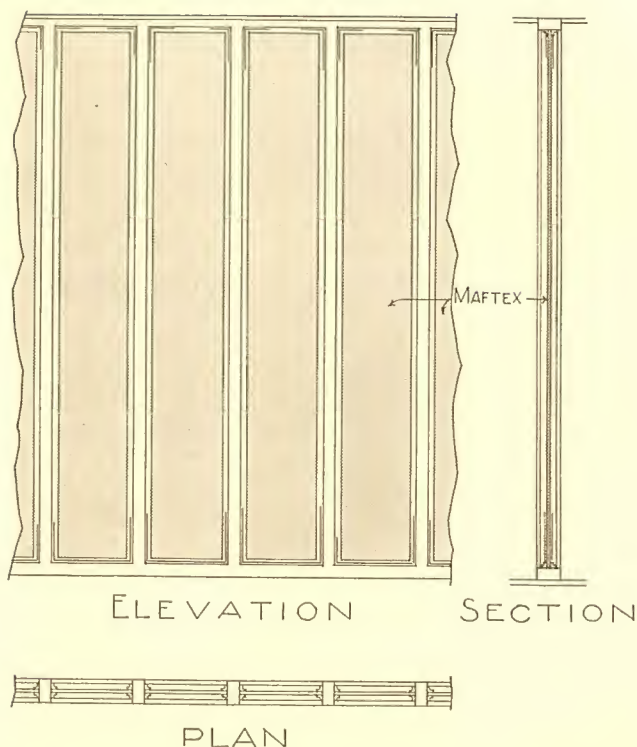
A type of construction developed for summer cottages, clubs, etc., MAFTEX, cut to the width required, is placed midway between the studs and held in place with wood moldings fastened direct to the studs on each side of the MAFTEX. This means only one line of separation between rooms instead of the usual two thicknesses when plastered or boarded on both faces of studs, but gives an economical and effective result. The ceiling would consist of exposed joists with the MAFTEX under the flooring above showing, as illustrated in Fig. 5.
